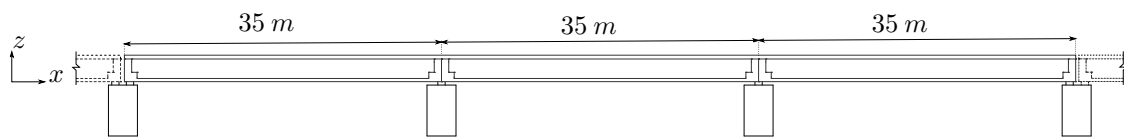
Longitudinal section of chosen dual U-beam bridge
